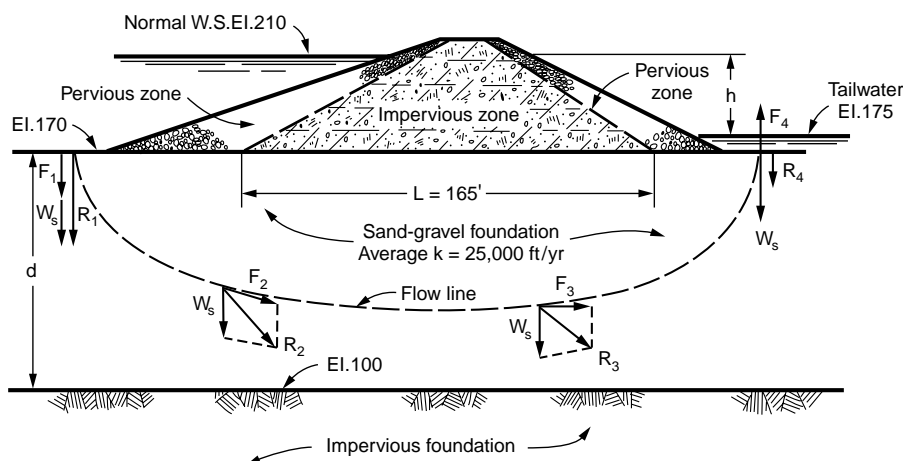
Seepage under an earth dam. (Adapted from U.S. Department of the Interior, Bureau of Reclamation, 1987, *Design of Small Dams*, p. 204, 205, U.S. Government Printing Office, Denver, CO.)
